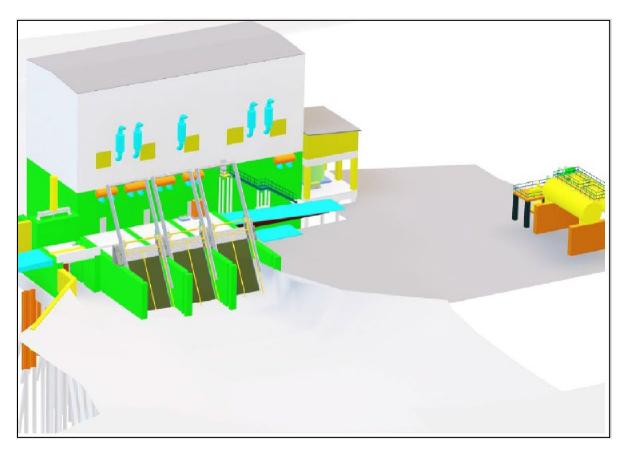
Typical Site Plan of a Pump Station with Small Pumping Capacity
